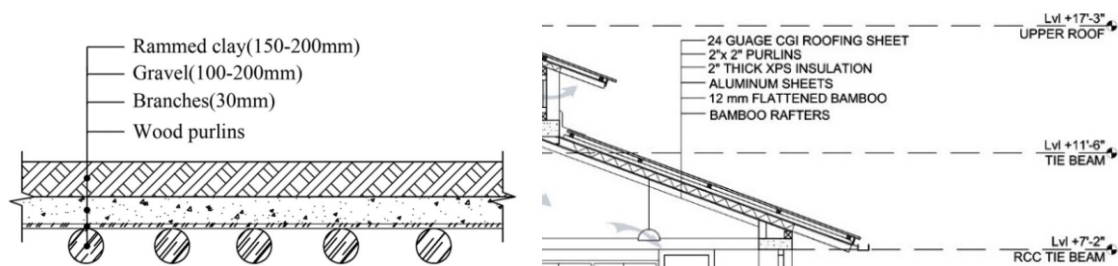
Roof Section Detail of rammed roof(SMM) & CGI roof(rammed earth)
